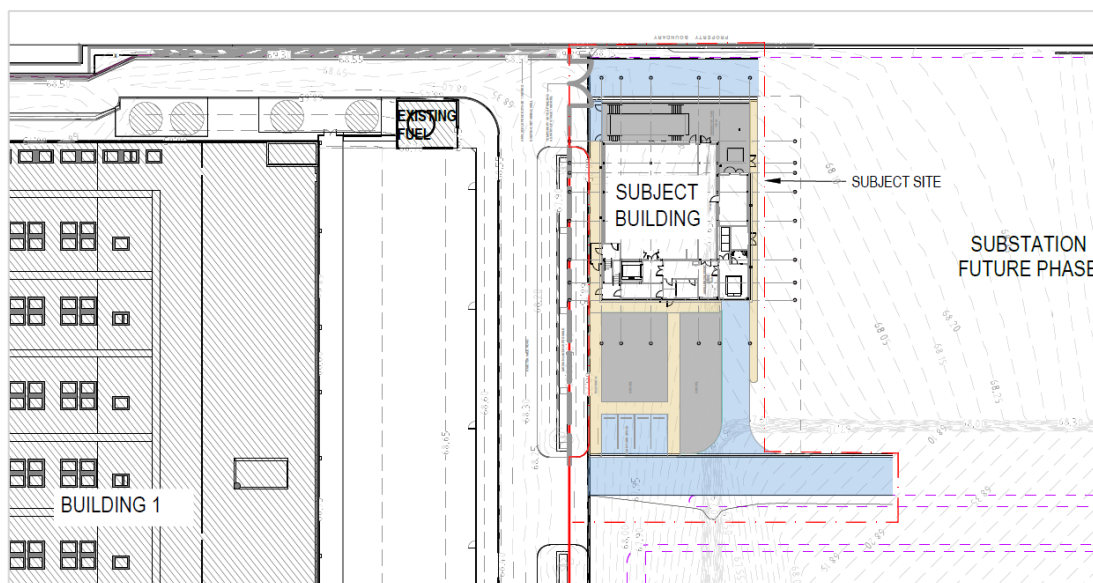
Extract from the civil site location plan showing the additional area proposed to be included in stage 1.
